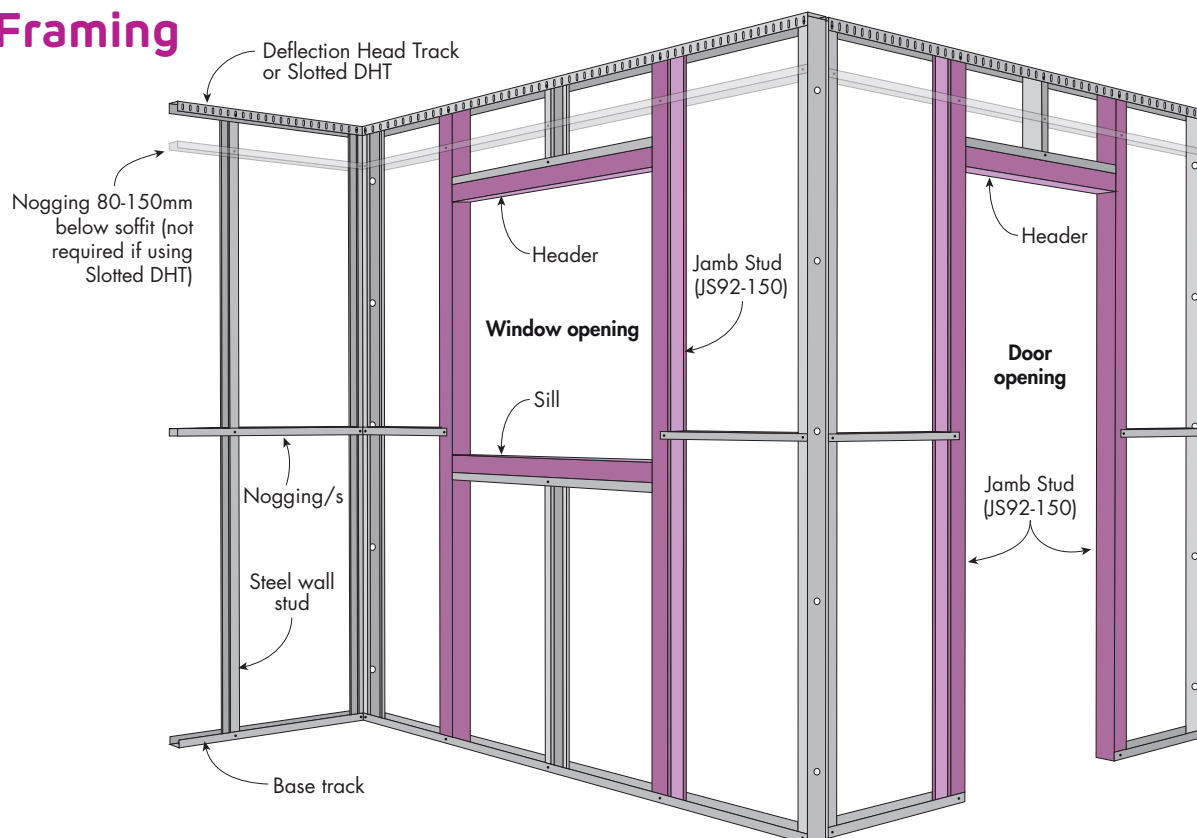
Typical External Steel Frame Wall with Window and Door Openings
